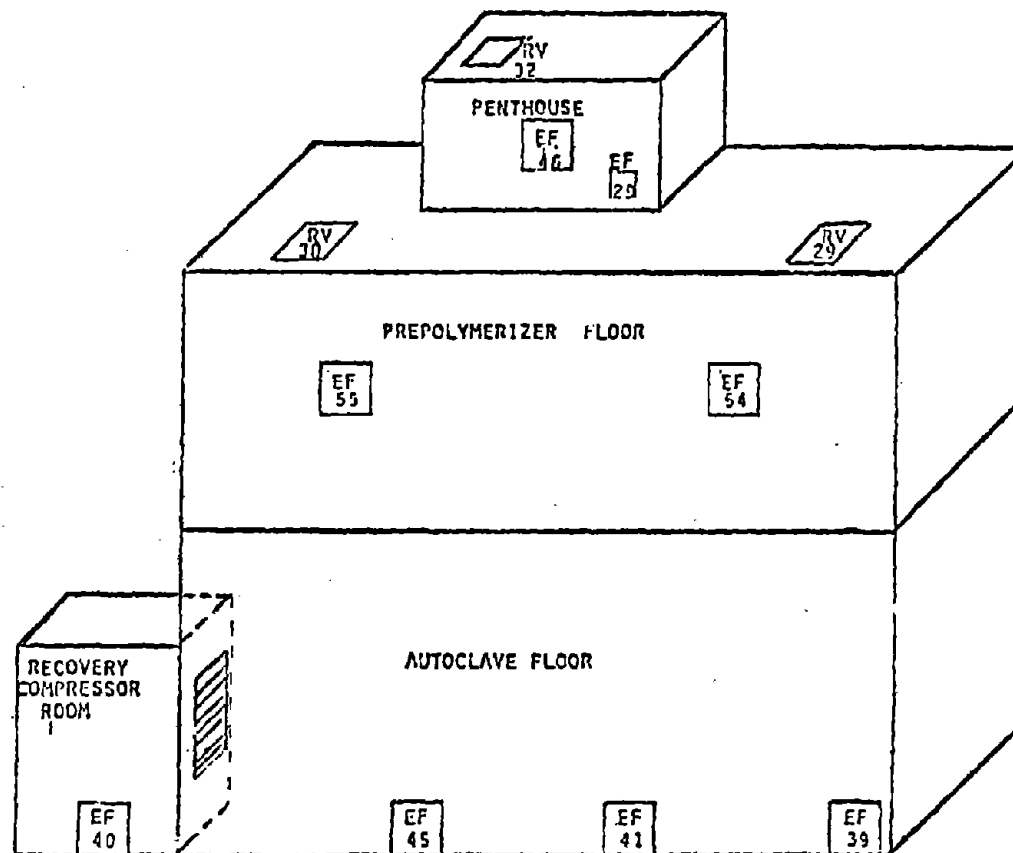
, Typical General Ventilation Scheme For A PVC Plant
